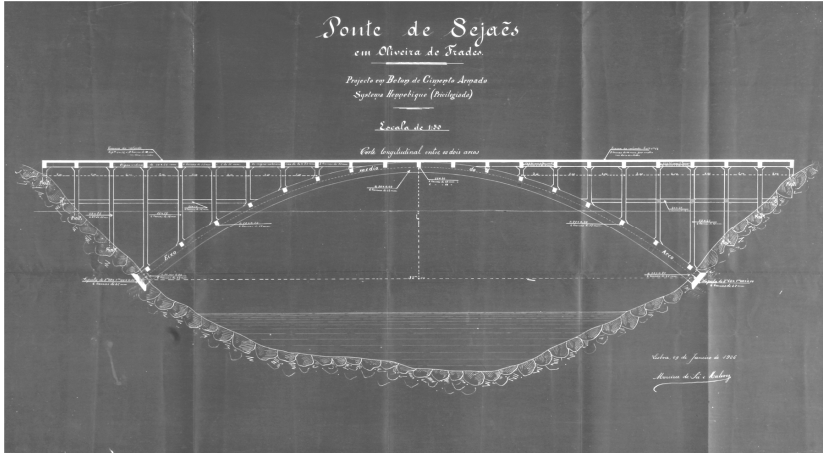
Oliveira de Frades bridge over the River Vouga, basic plan, 1906. (IFA/CAA)
